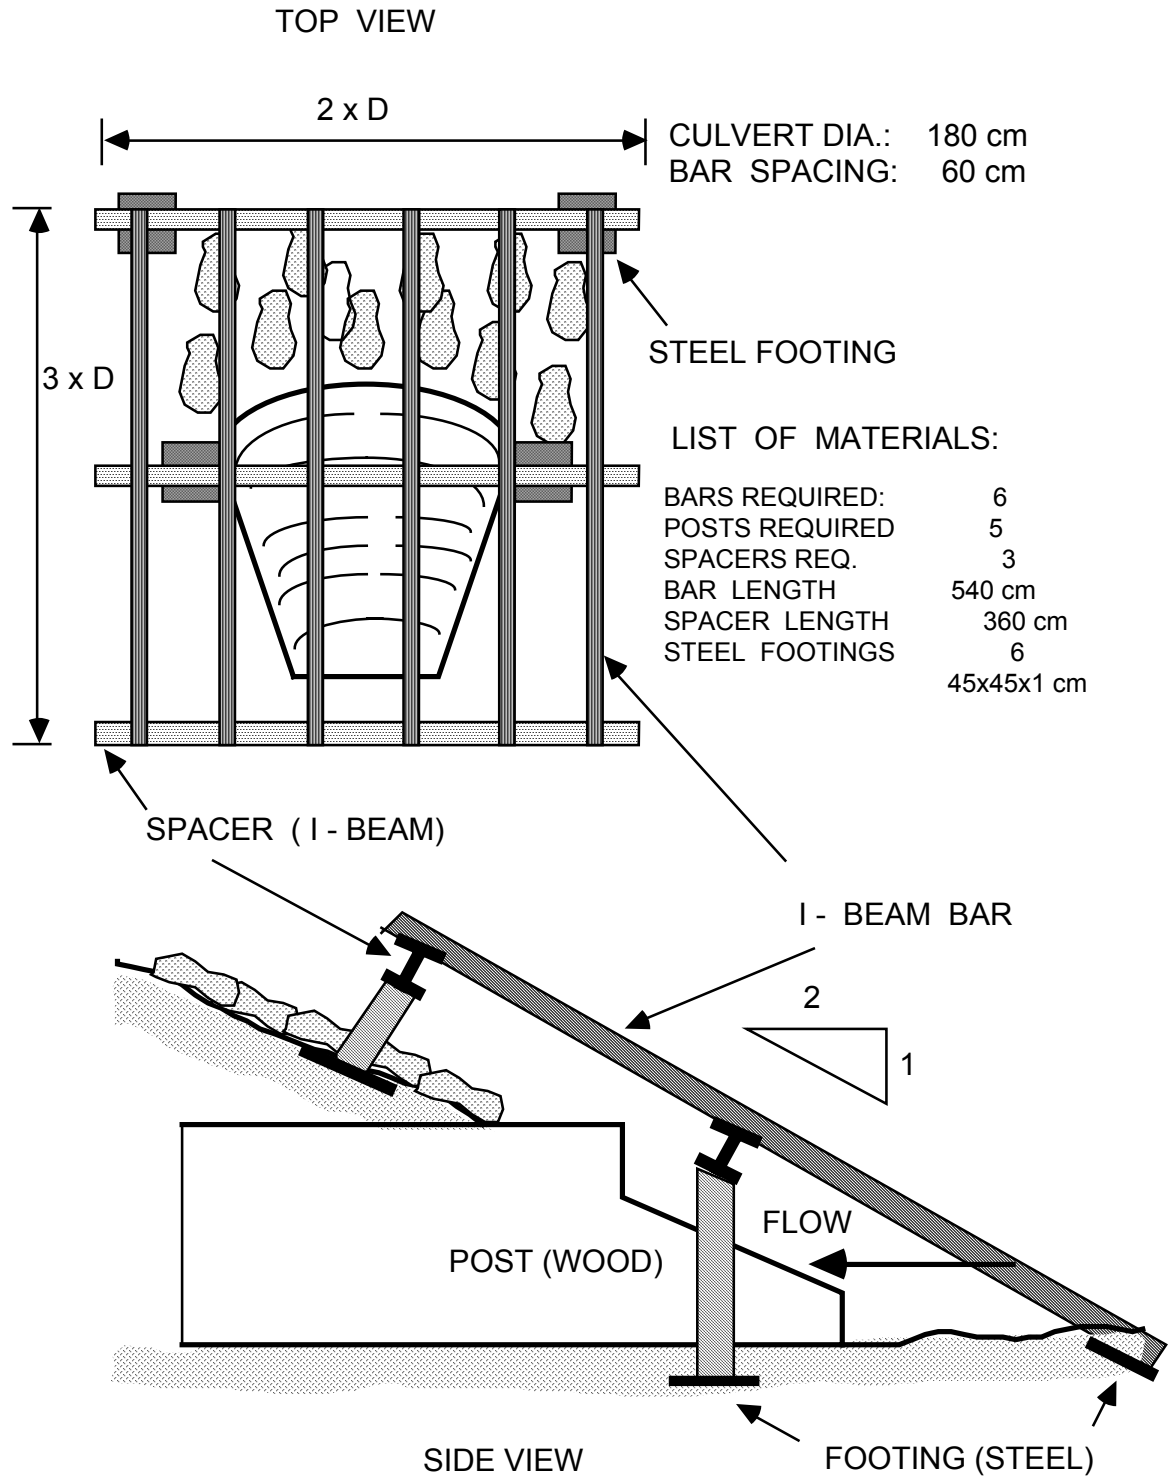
Debris control structure--trash rack made of steel rail (I-beam) placed over inlet.
